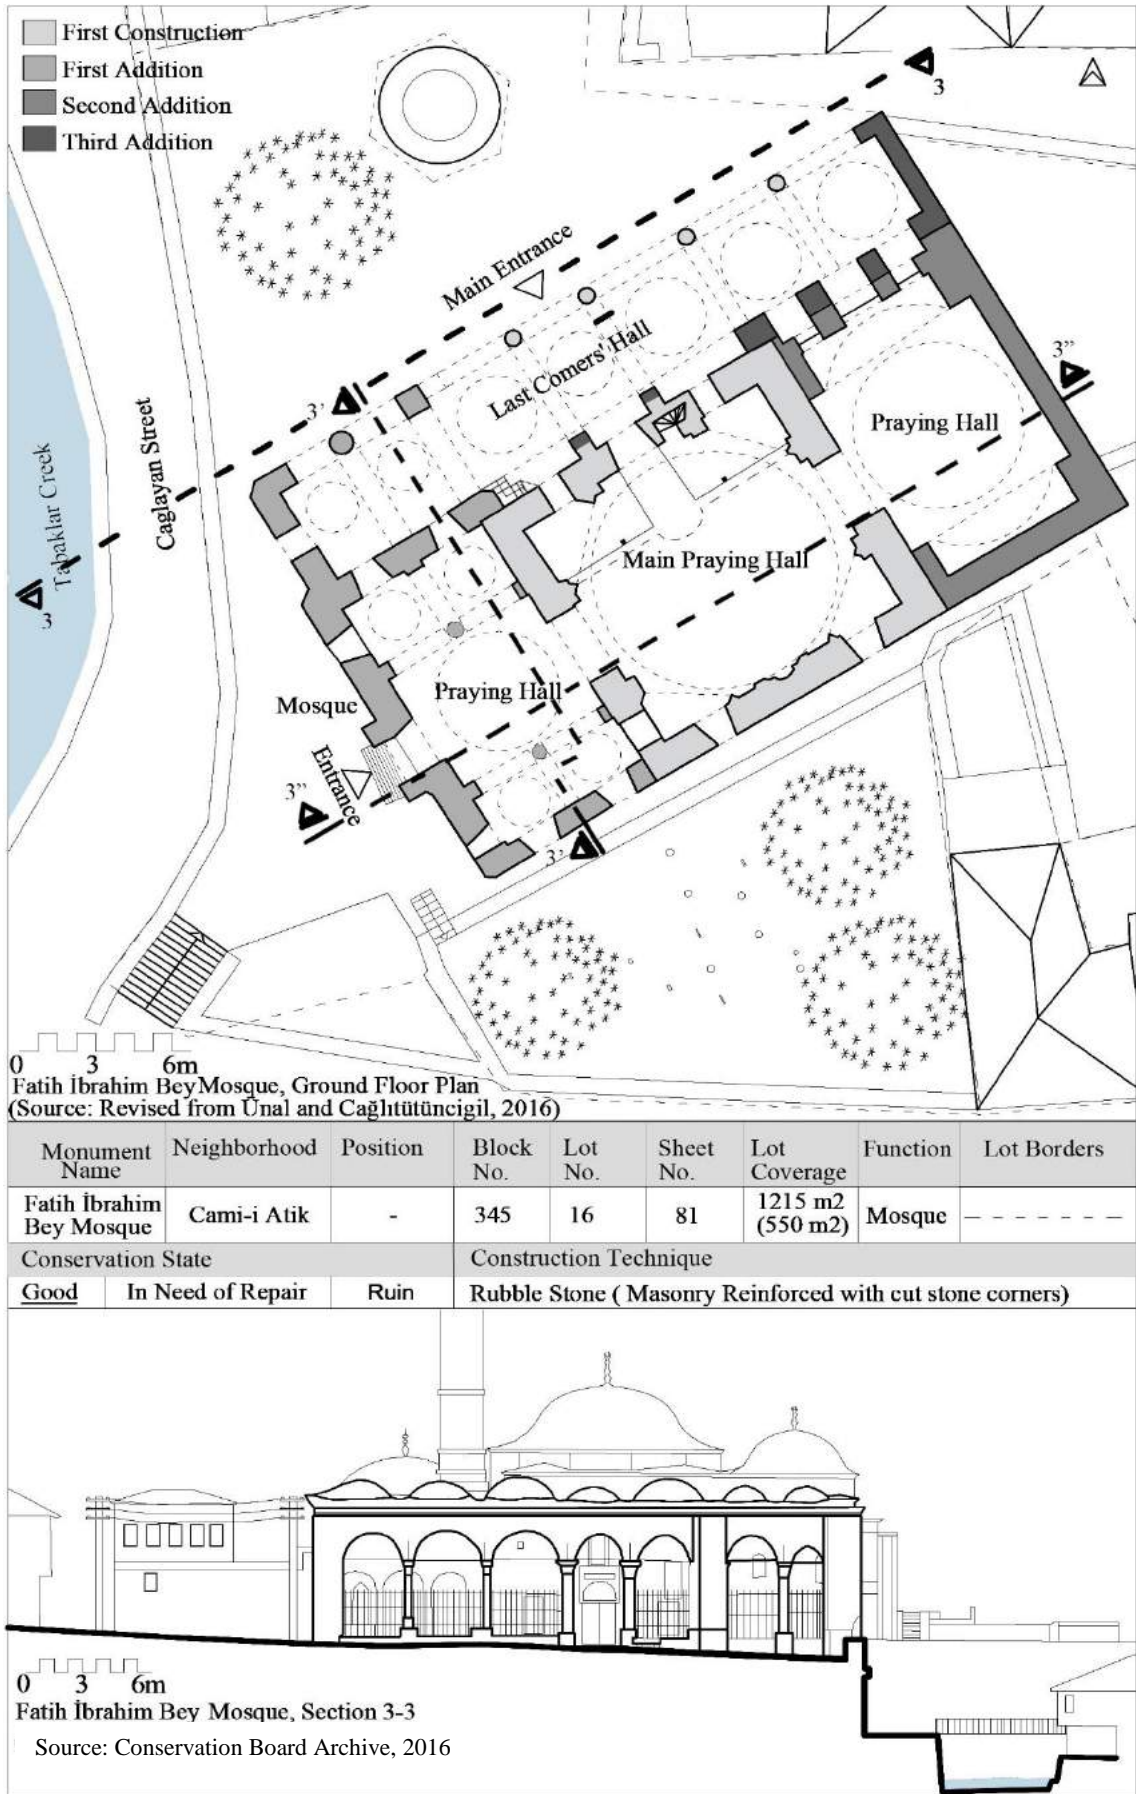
Ground floor plan and entrance elevation, Fatih Ibrahim Bey Mosque
